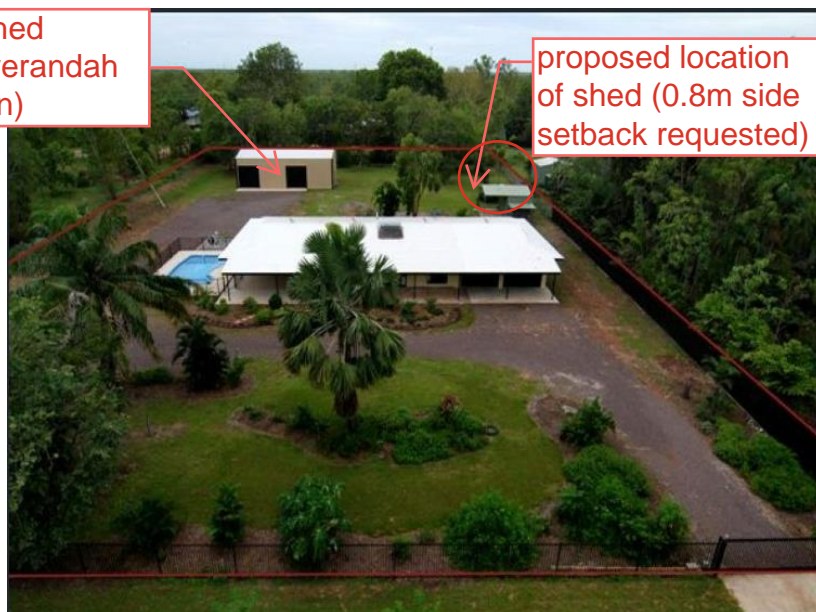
Existing lawfully constructed shed (November 2015 – prior to shade structure addition)
